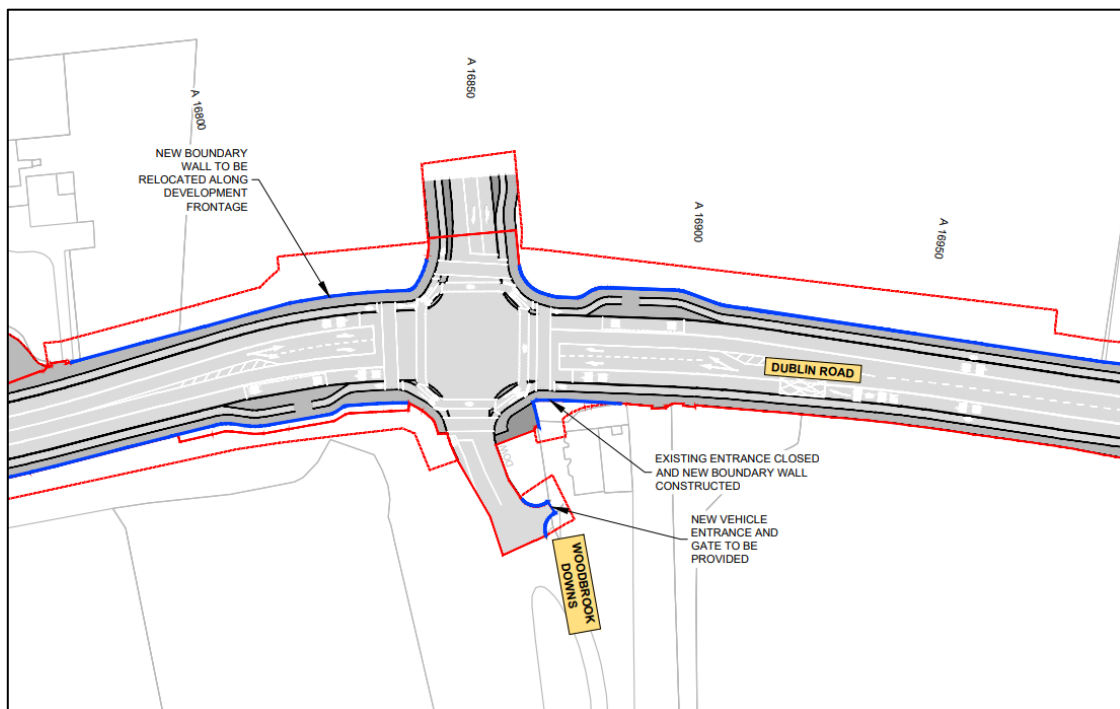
Extract from Fencing and Boundary Treatment Drawings at Woodbrook Downs (Sheet 48)
